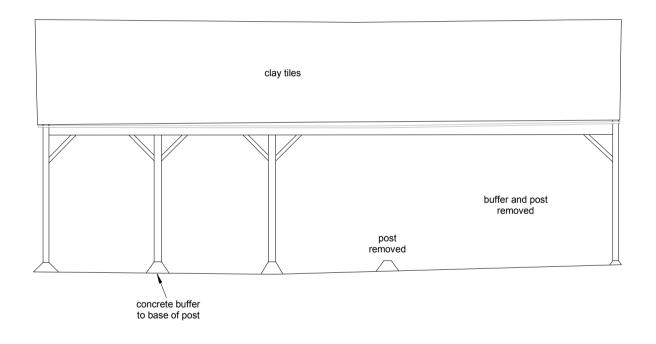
Structure 5, 1898-1918 Dutch barn north-east elevation.
